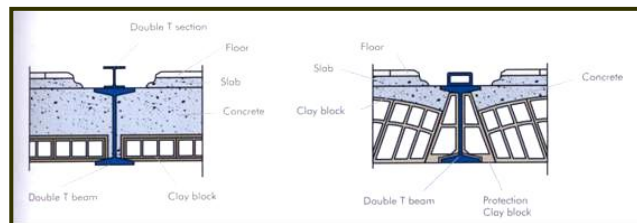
Consolidation systems of floor steel beams, by increasing the section modulus with additional steel elements to the top flange of the existing beams.
